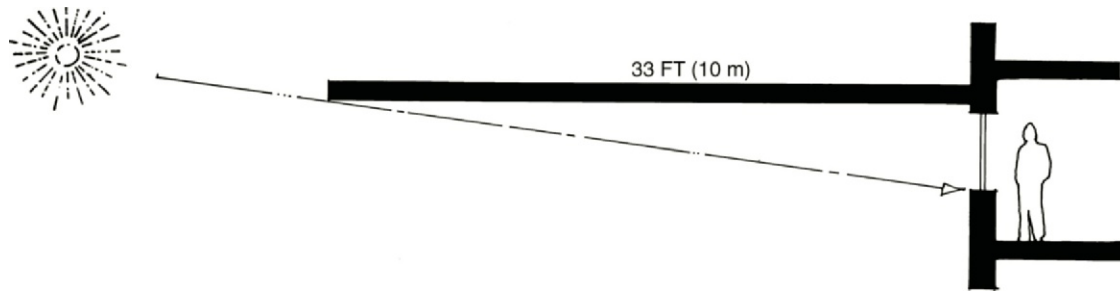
The 33 ft (10 m) overhang needed to shade a 4 ft (1.2 m) window on August 21 at 6 P.M. at 36° N latitude illustrates the futility of trying to fully shade east and west windows with fixed horizontal overhangs.
